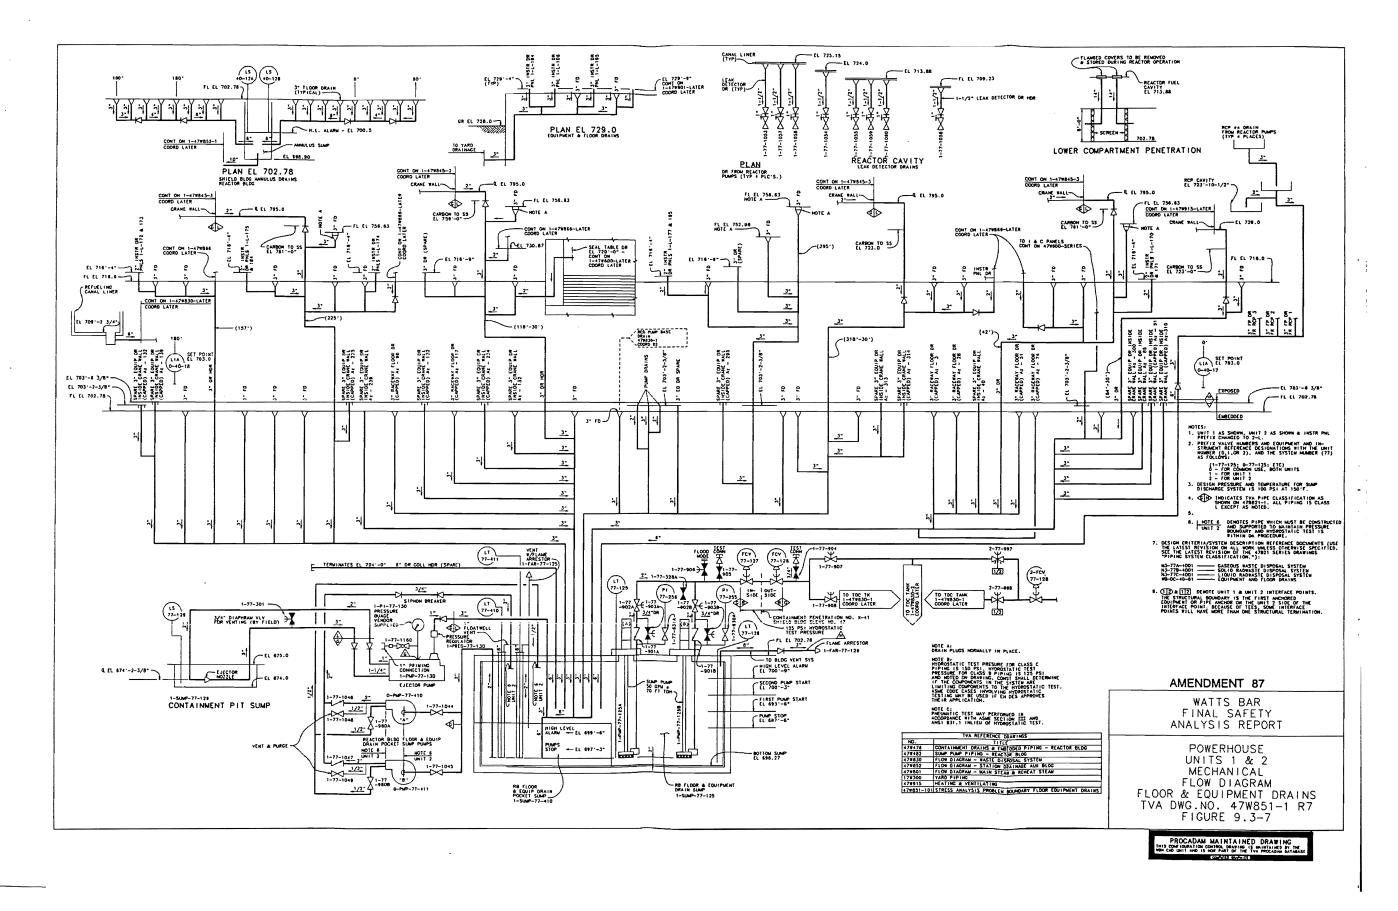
Powerhouse Units 1 & 2 Mechanical Flow Diagram - Floor and Equipment Drains
